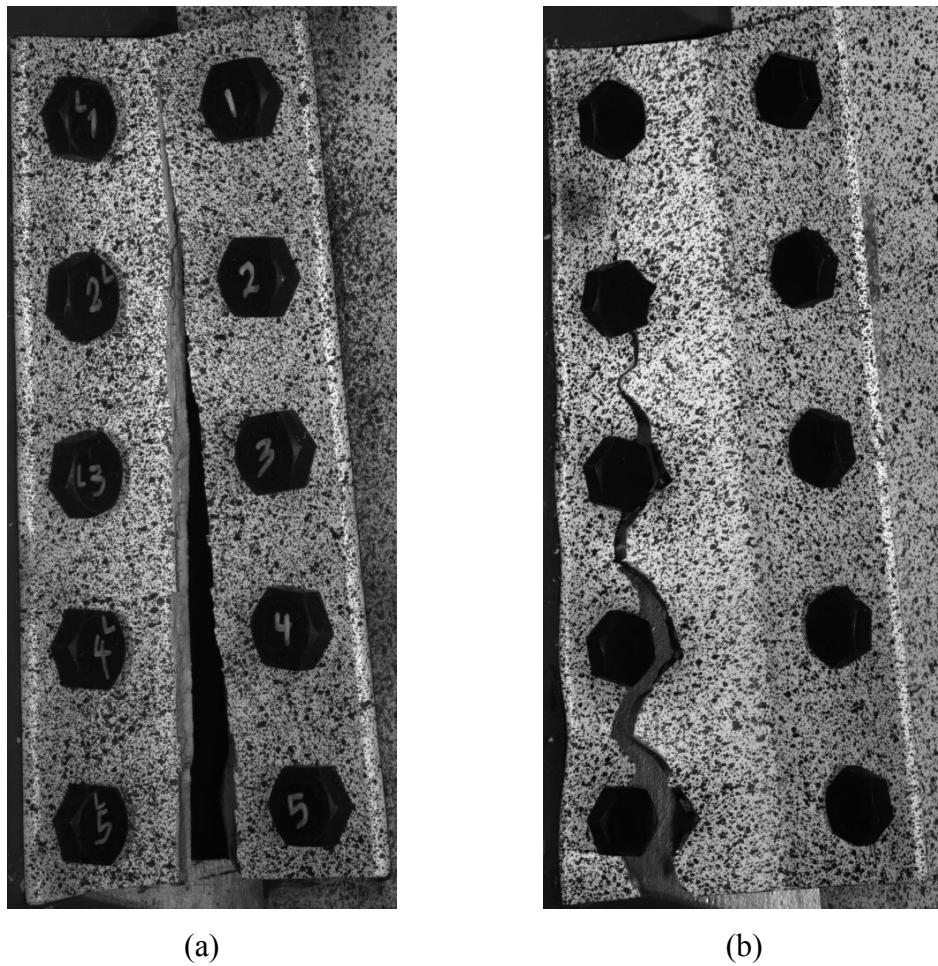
Failure Modes of Double Angles: (a) Tearing of Gross Section Near the Heel; (b) Fracture Near Bolt Line Attached to the Stub Column
